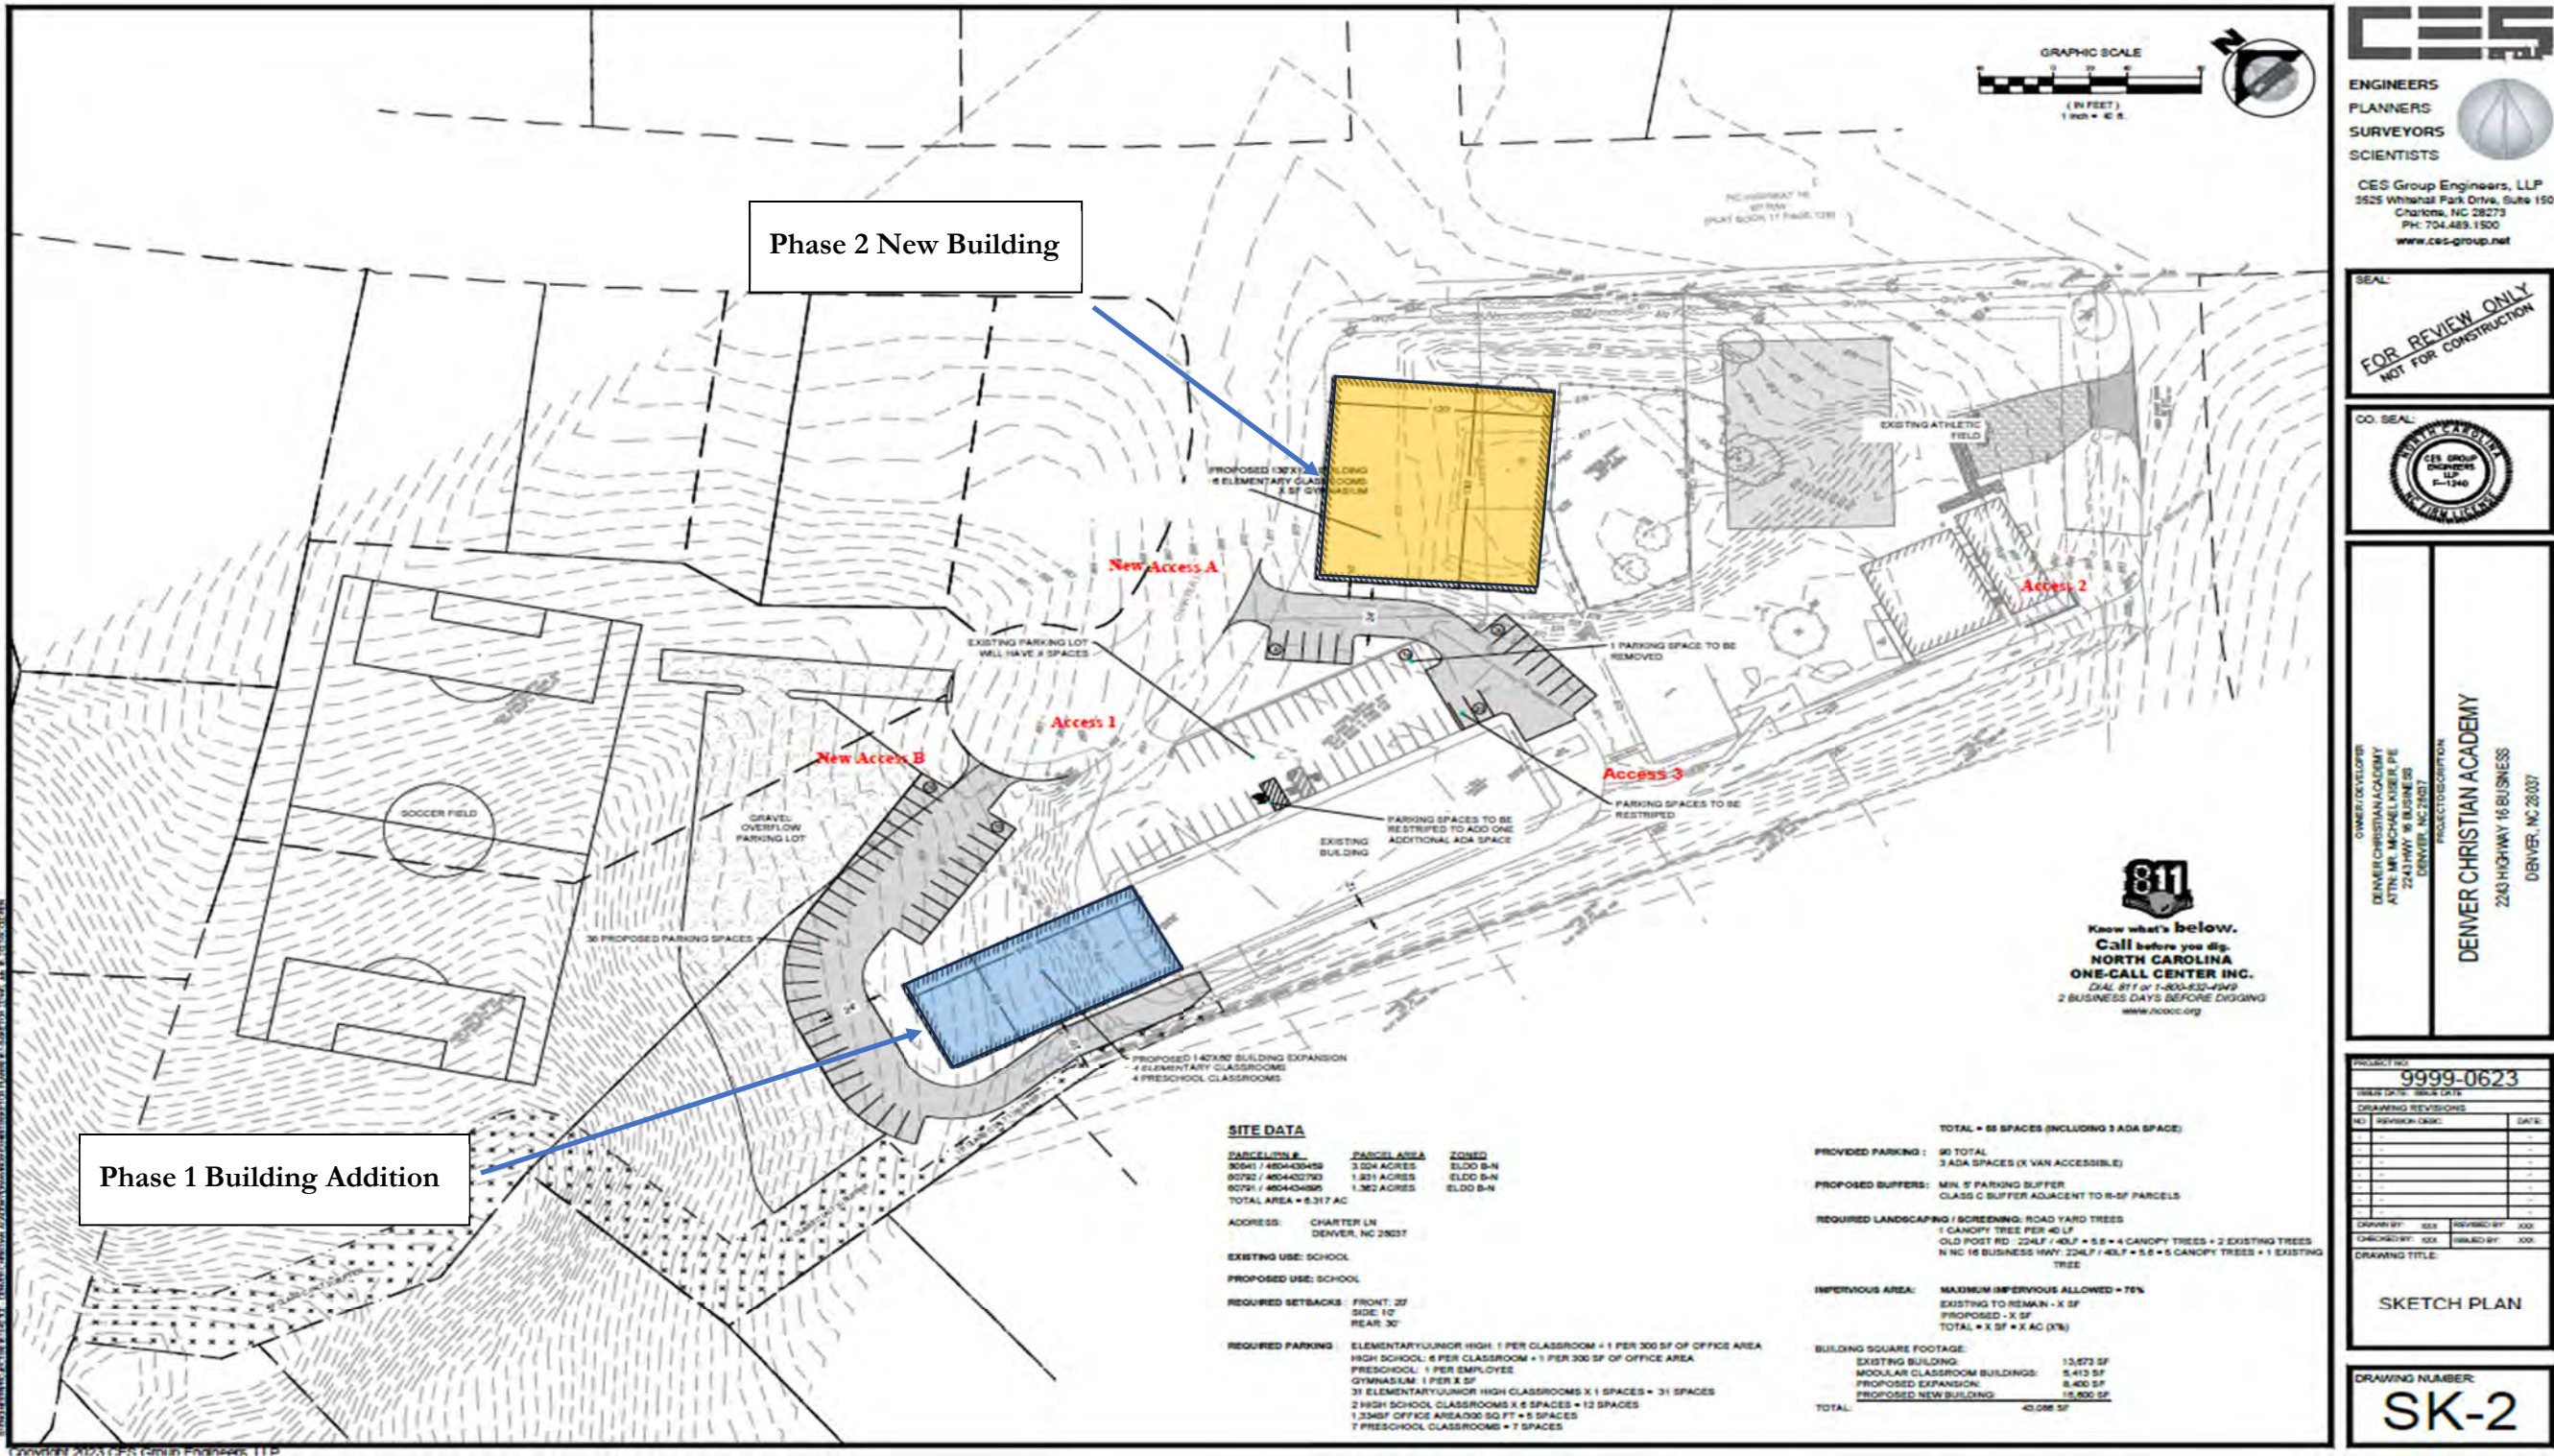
Site Plan - Denver Christian Academy (Source: CES Group Engineers, LLP)
